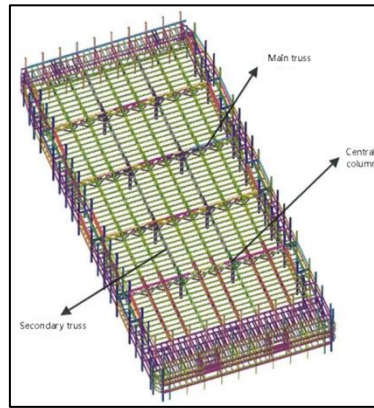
Double-Layer Exhibition Hall Floor Structure Model
